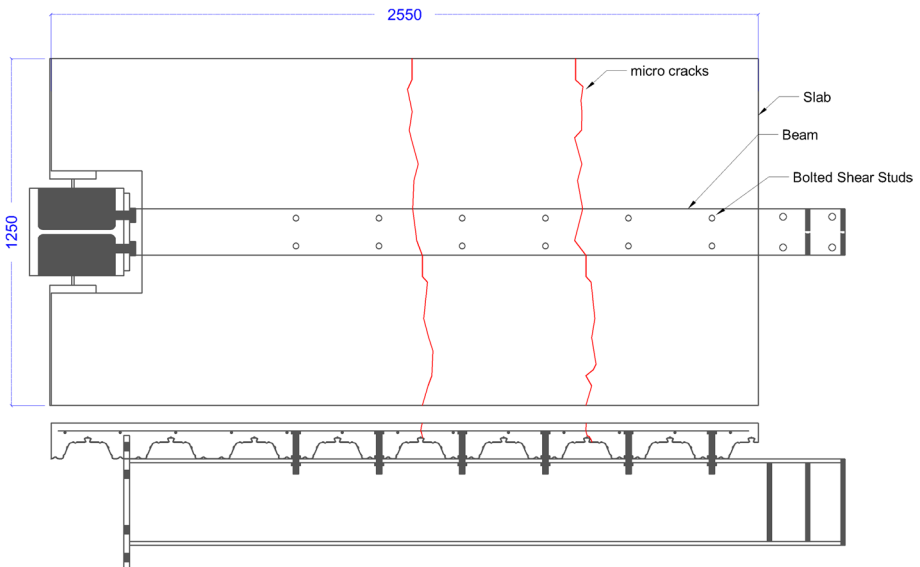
Observed crack pattern in Solid connection specimen (mm)
